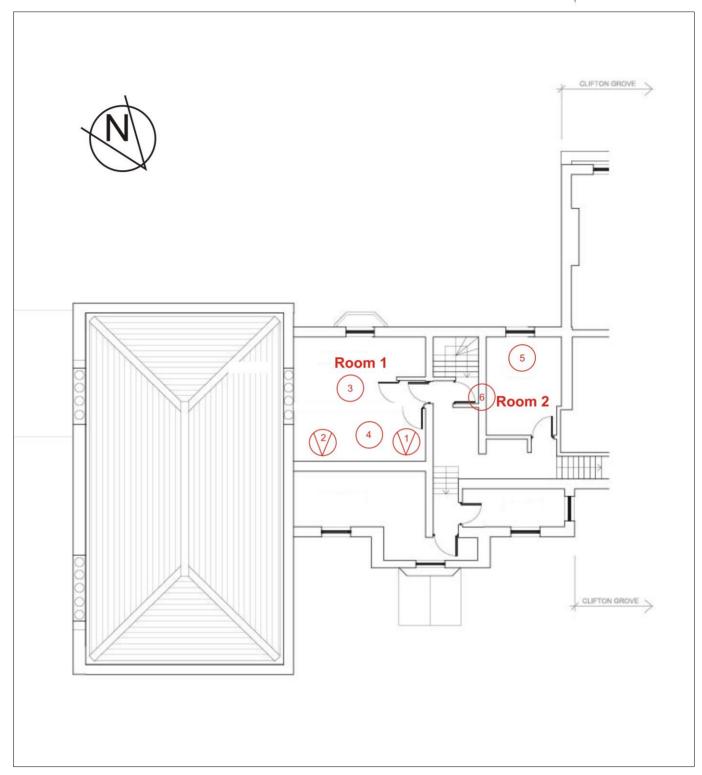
Photo location plan Second Floor (Base Plan © 105 West Architects Ltd)
